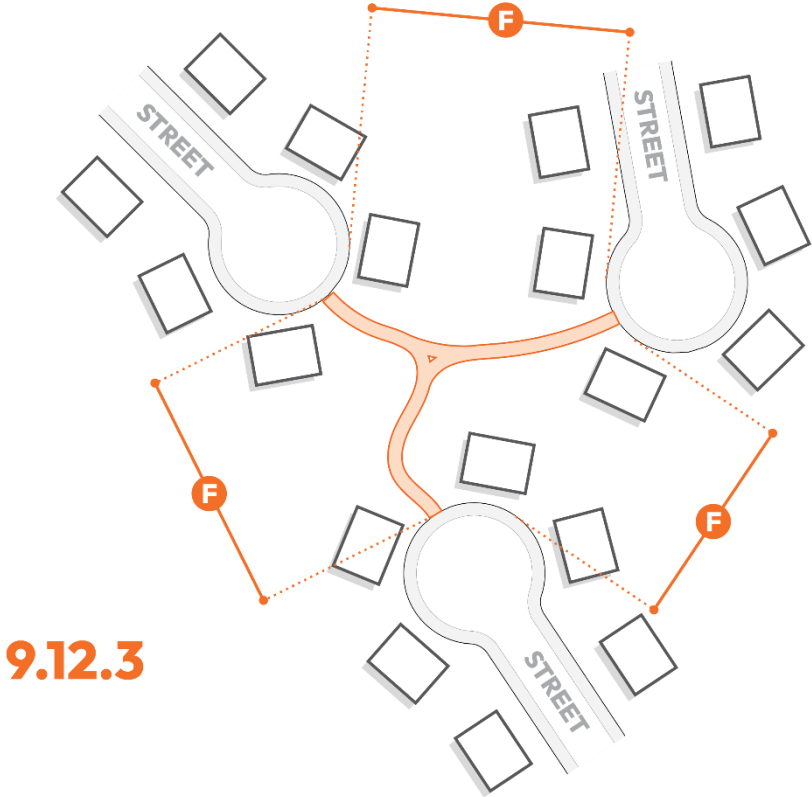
Pedestrian Walkway Dead End Street to Adjacent Sidewalk Connection
